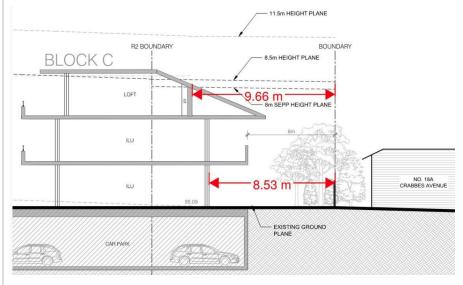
Extract of Section J showing setback from adjoining dwelling 18 A Crabbes Avenue. R2 boundary in blue (Source: Hyecorp/Amglen)
